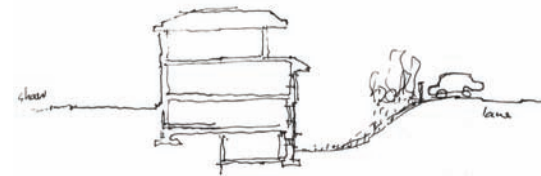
Site visit sketch of backyard ravine condition at Shaw Street
